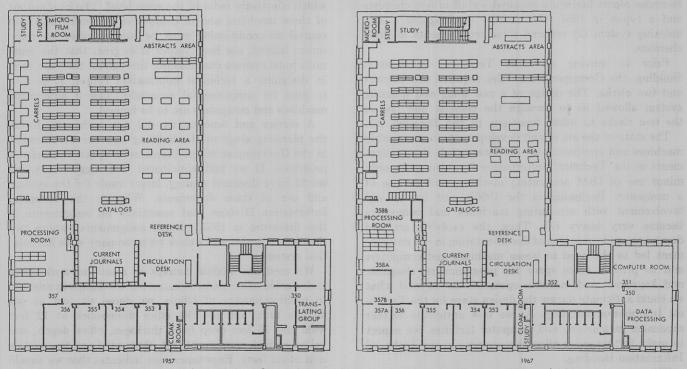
Floor plans of third floor of the Technical Information Building in 1957 and 1967
